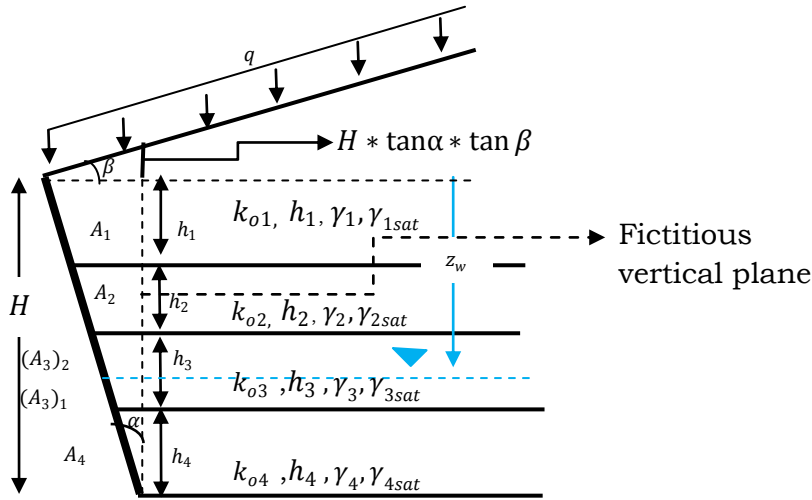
Multi layer soils with a retaining wall of inclined back face and inclined ground
